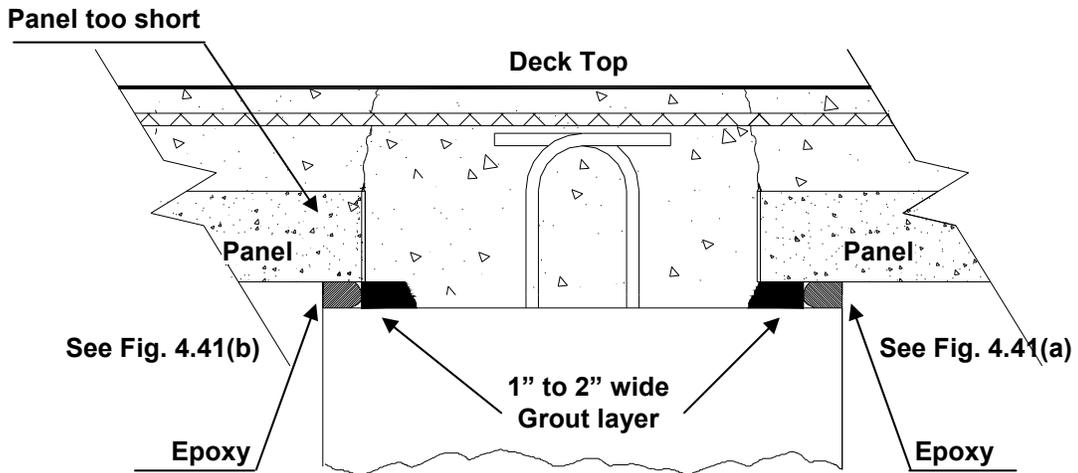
Bridge # 130085 Bearing Detail after Epoxy Repair
